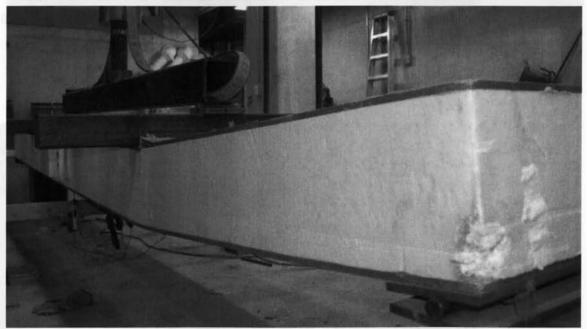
View of panel S-4 after failure showing deflected shape and OSB top facing crushing at the quarter point load location
